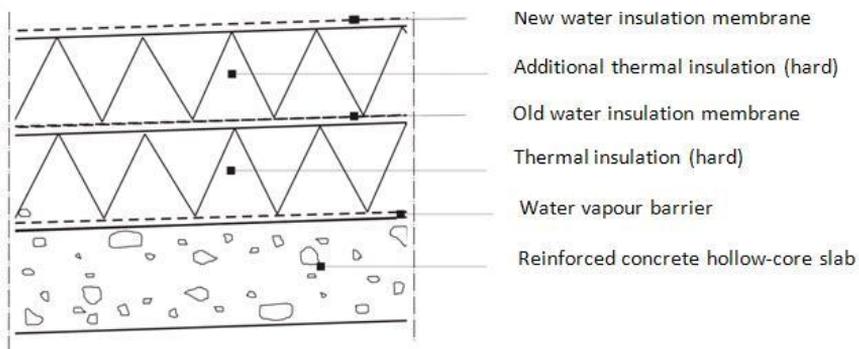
Unventilated, gently sloped roof. Original structure and renovation with additional thermal insulation.
